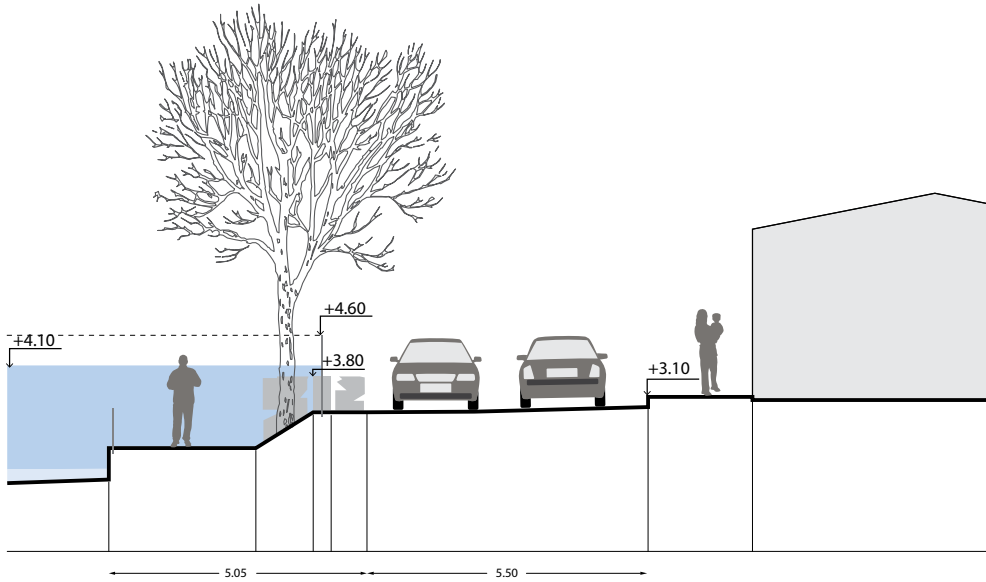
Proposed situation. A new dike or levee could be added as a walking route with
